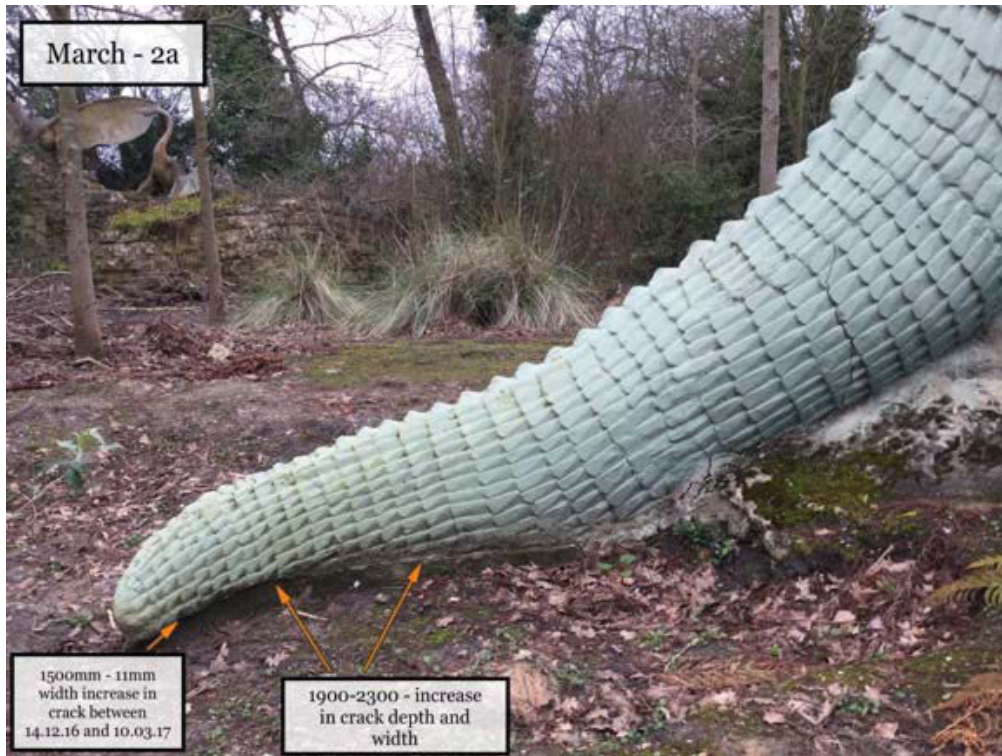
Photographed 10.03.17 - Locating the points of greatest crack depth and width increase<sup>55</sup>
